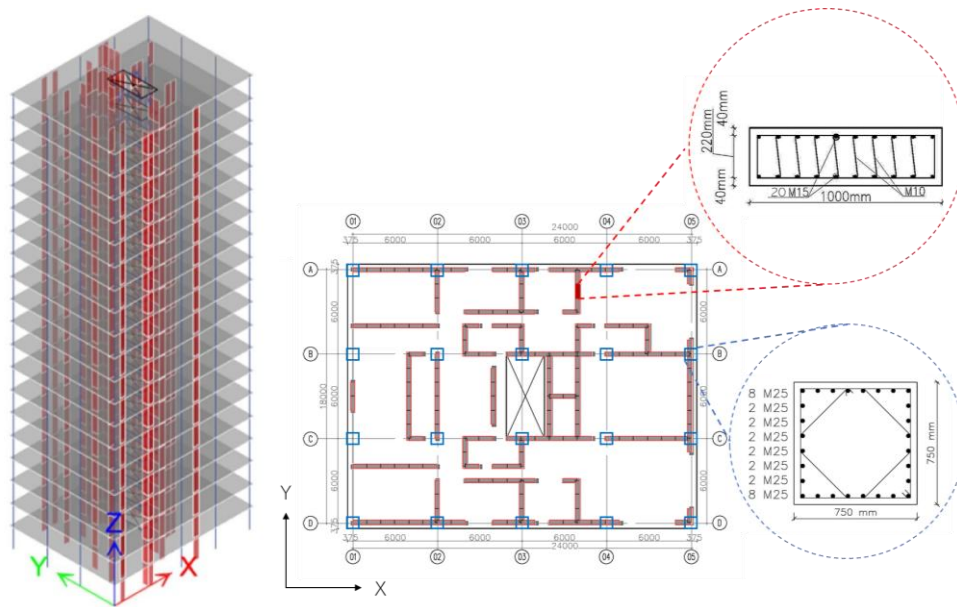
Study building a) isometric view b) plan view with shear wall details (Alanani and Elshaer 2023)
